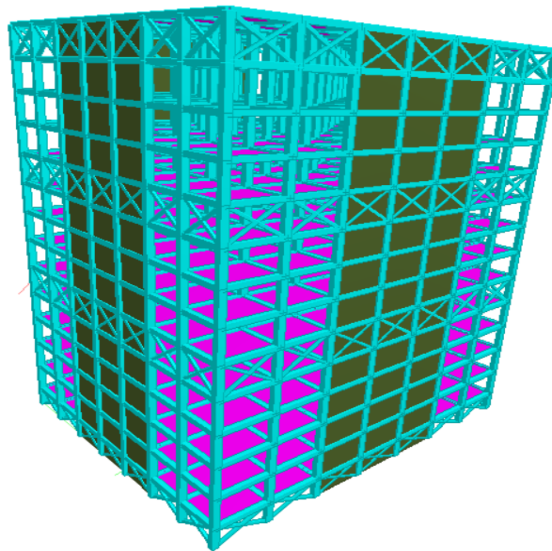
Structure With Belt Truss Of Outrigger Introducing With Shear Wall.
